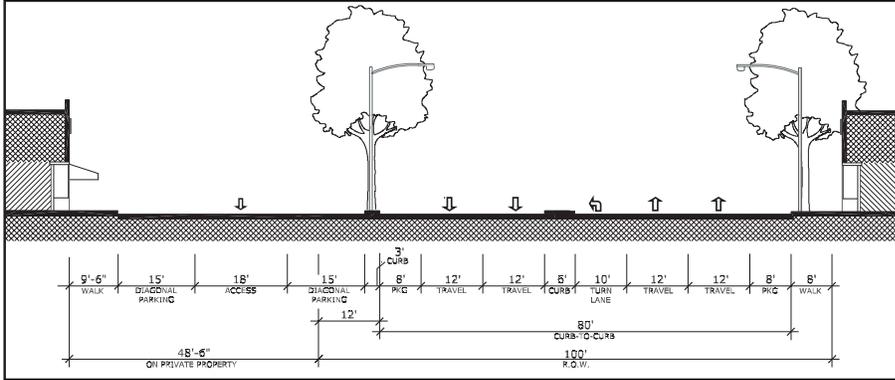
Existing street cross section between 143rd and 144th Avenues (Storm Block)
